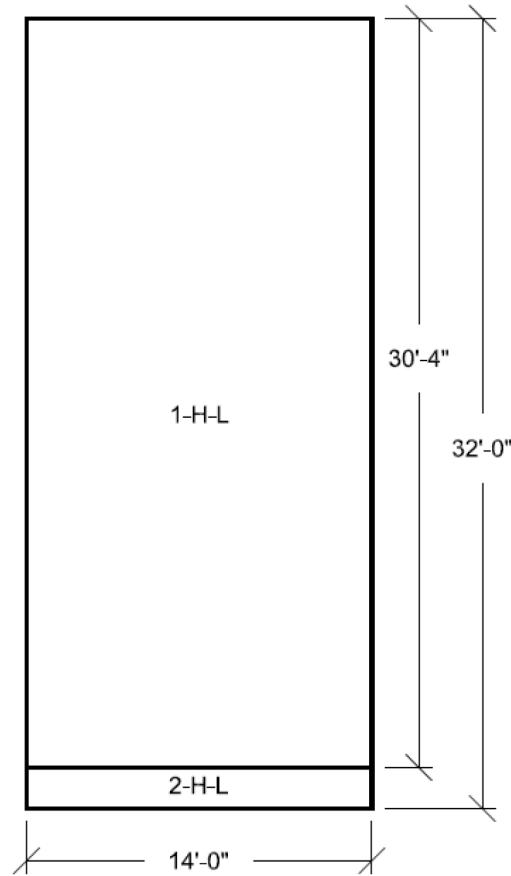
H.6-153 DGFOSV Slab 3 Looking Down
